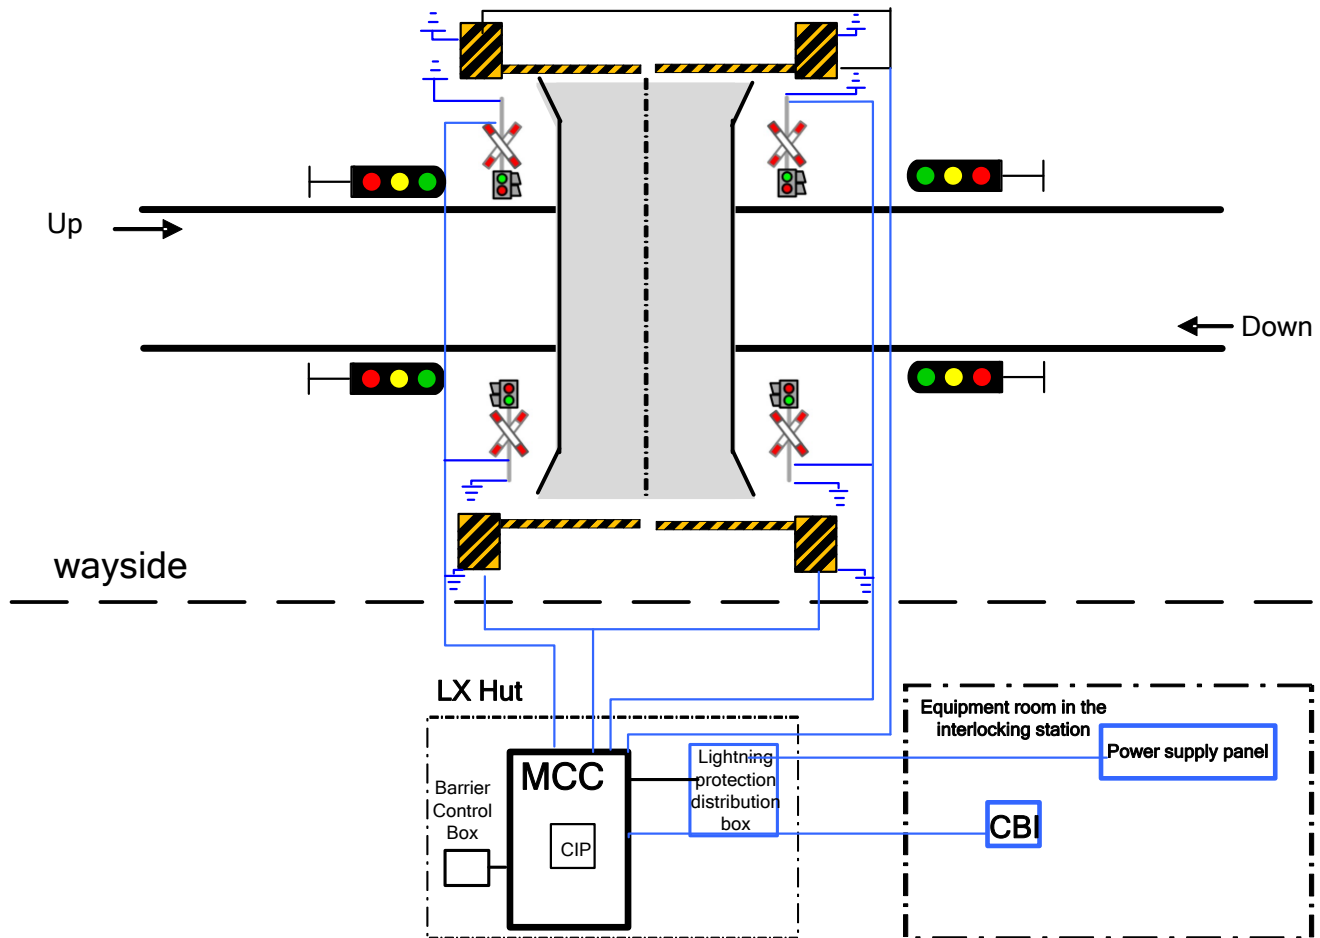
Layout and Arrangement of level crossing Equipment at crossing [29]
